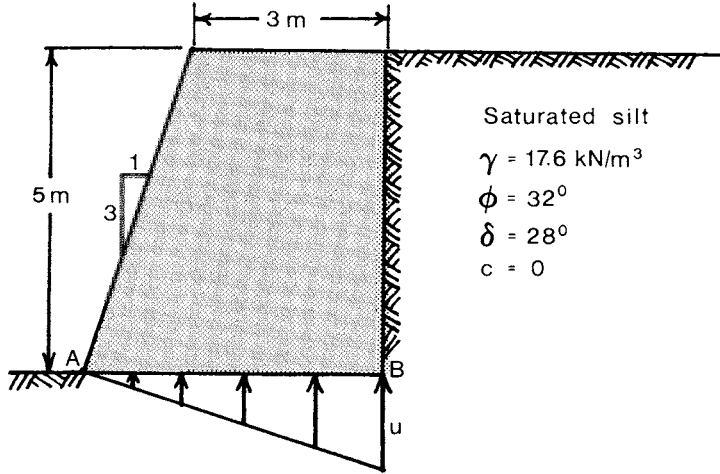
Wall retaining saturated soil, Problem 6.8.
